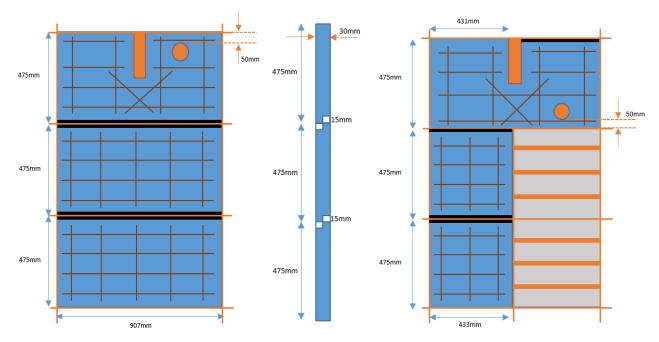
3C Pit panel reinforcing (special layout to stop cracking at top of panel)
